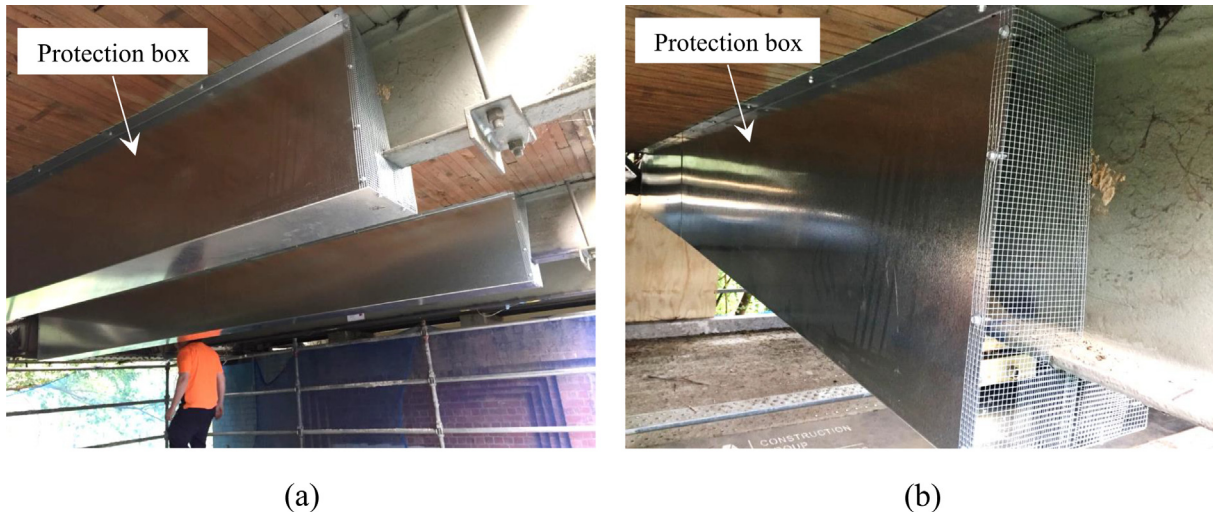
(a) In order to prevent any damage to the prestressed CFRP laminates owing to vandalism, a simple protective box made out of galvanized steel was installed; (b) the protective box was hanged from the timber deck (using screws).
